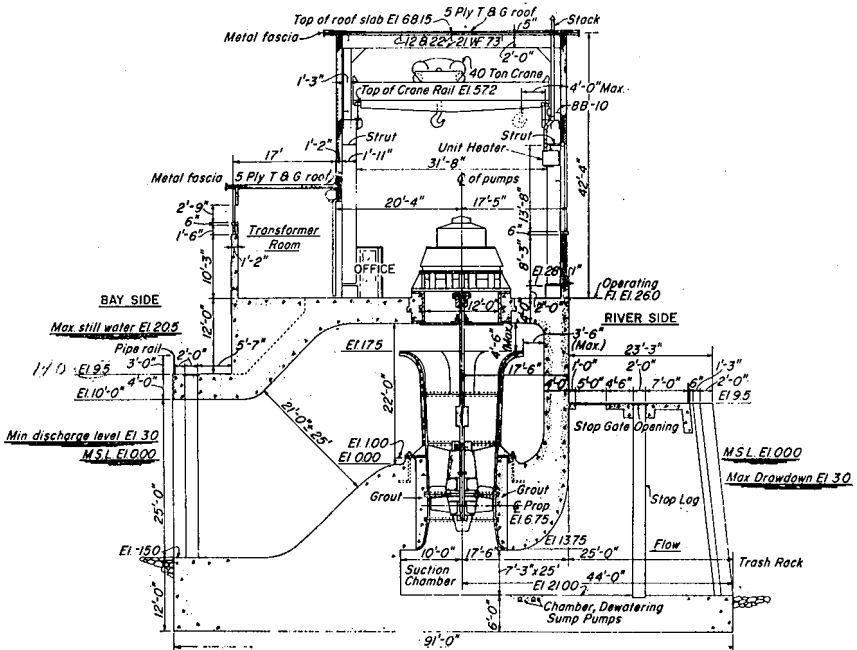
shows a typical cross section thru one of the pump bays showing the massiveness of the substructure. The presence of the platform at elev. +14.00 will trigger some waves so that they will break against the face of the structure.
